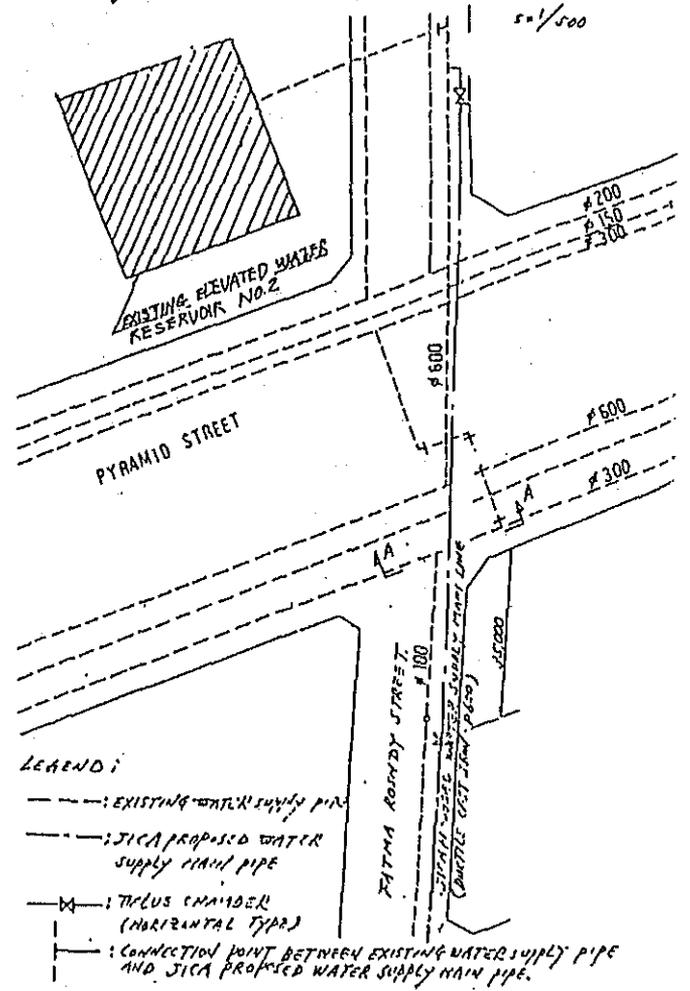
PLAN OF CONNECTION WITH EXISTING PIPE LINE
